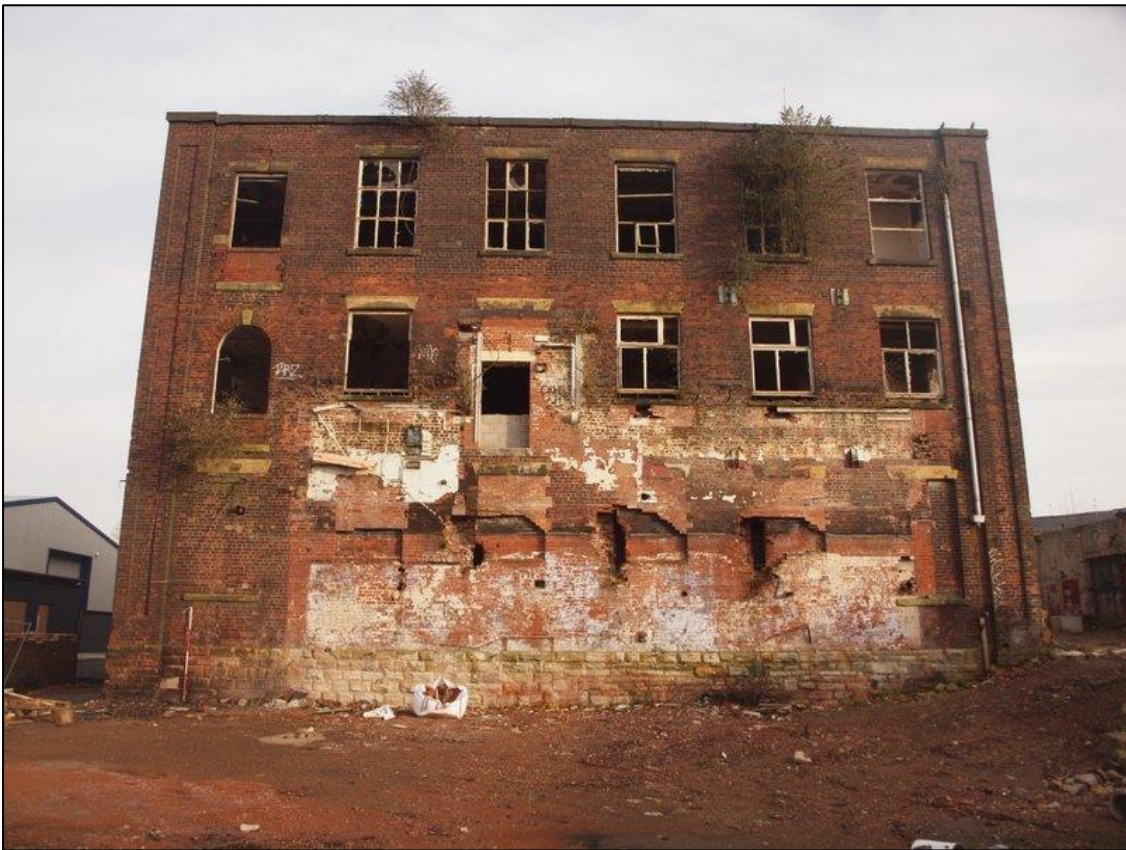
Southwest elevation showing ghost of removed building at ground floor level.
